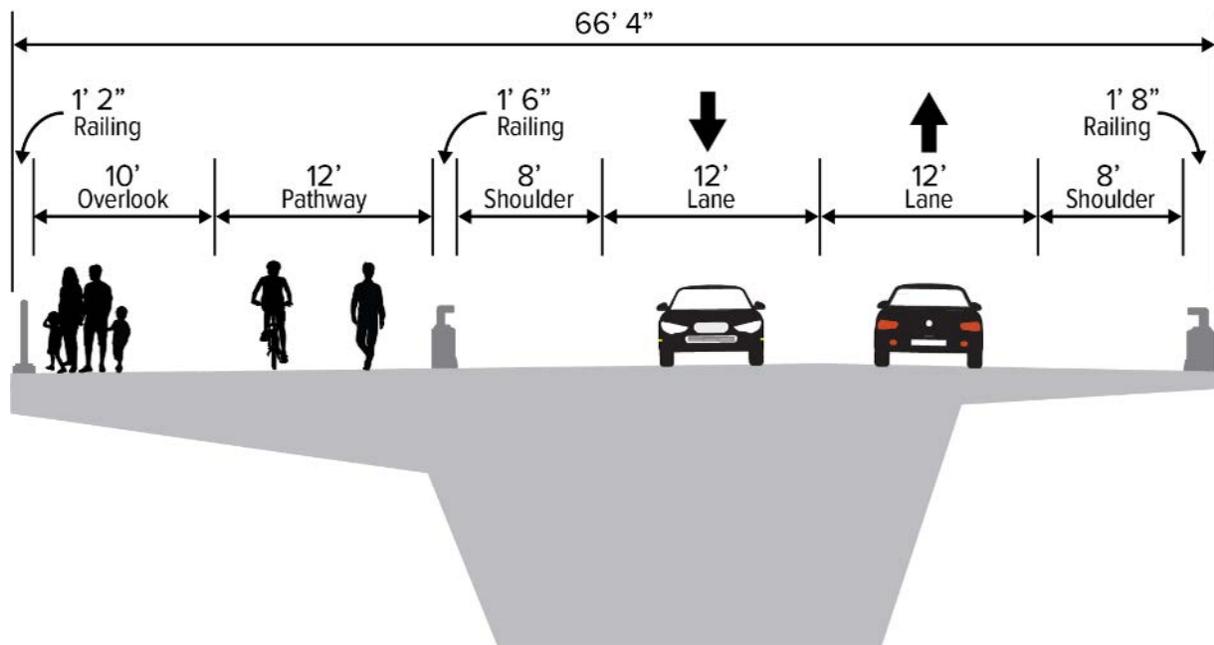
Replacement bridge cross section with pedestrian overlook
